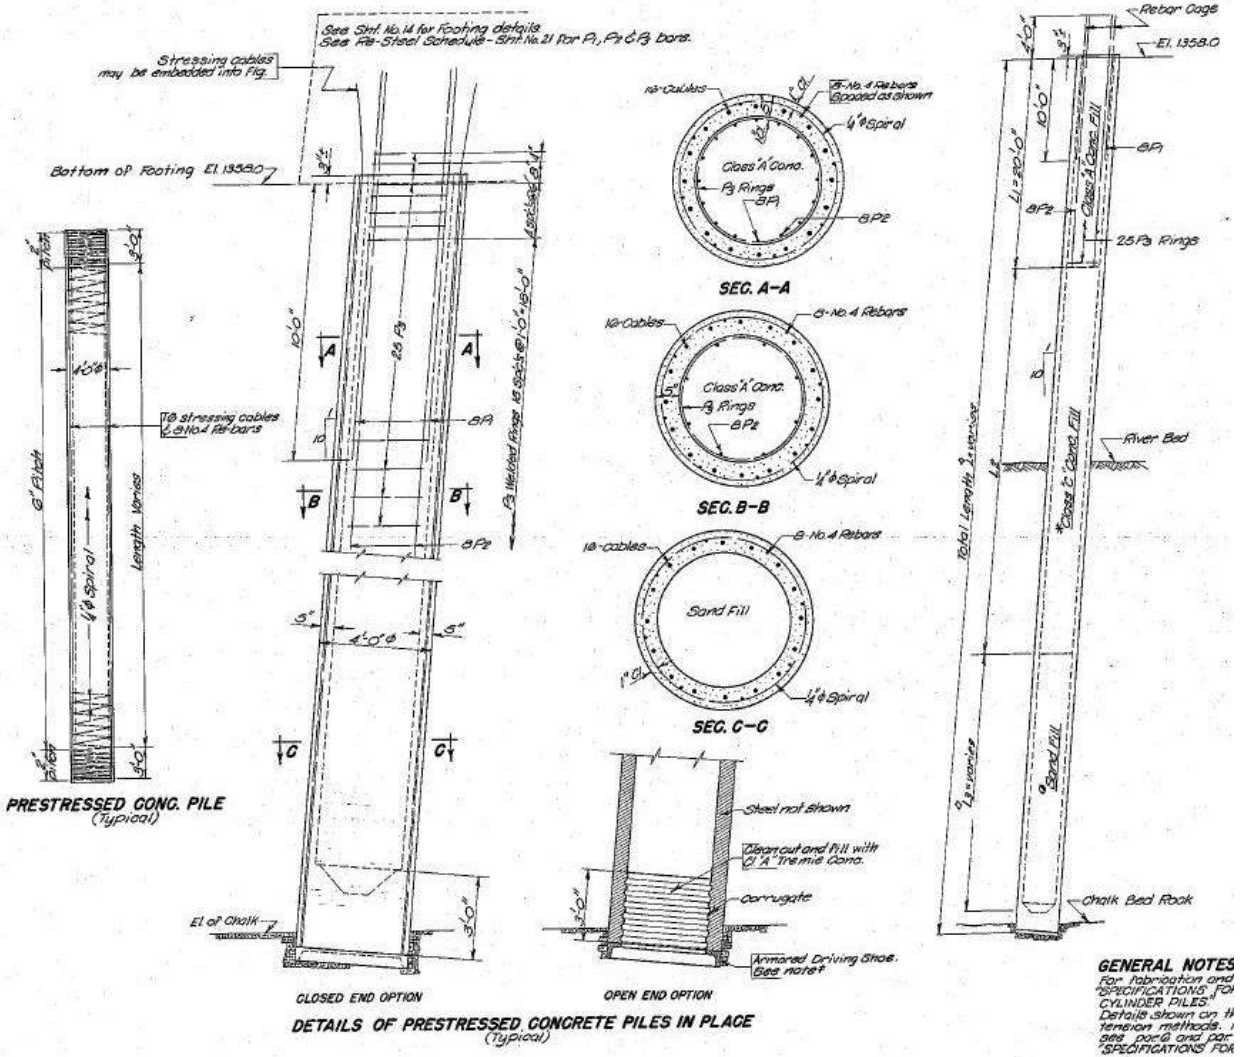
Details of prestressed post-tensioned concrete pile.<sup>16</sup>
